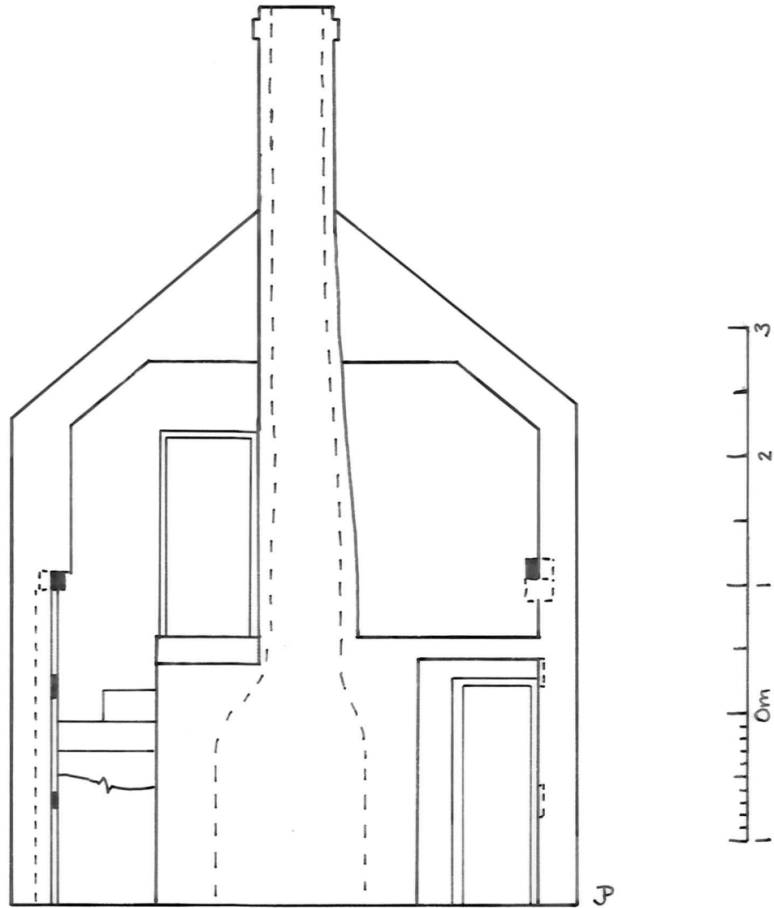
Cross section A-A' through the original cottage, looking east. Note the difference between first floor level and wallplates
